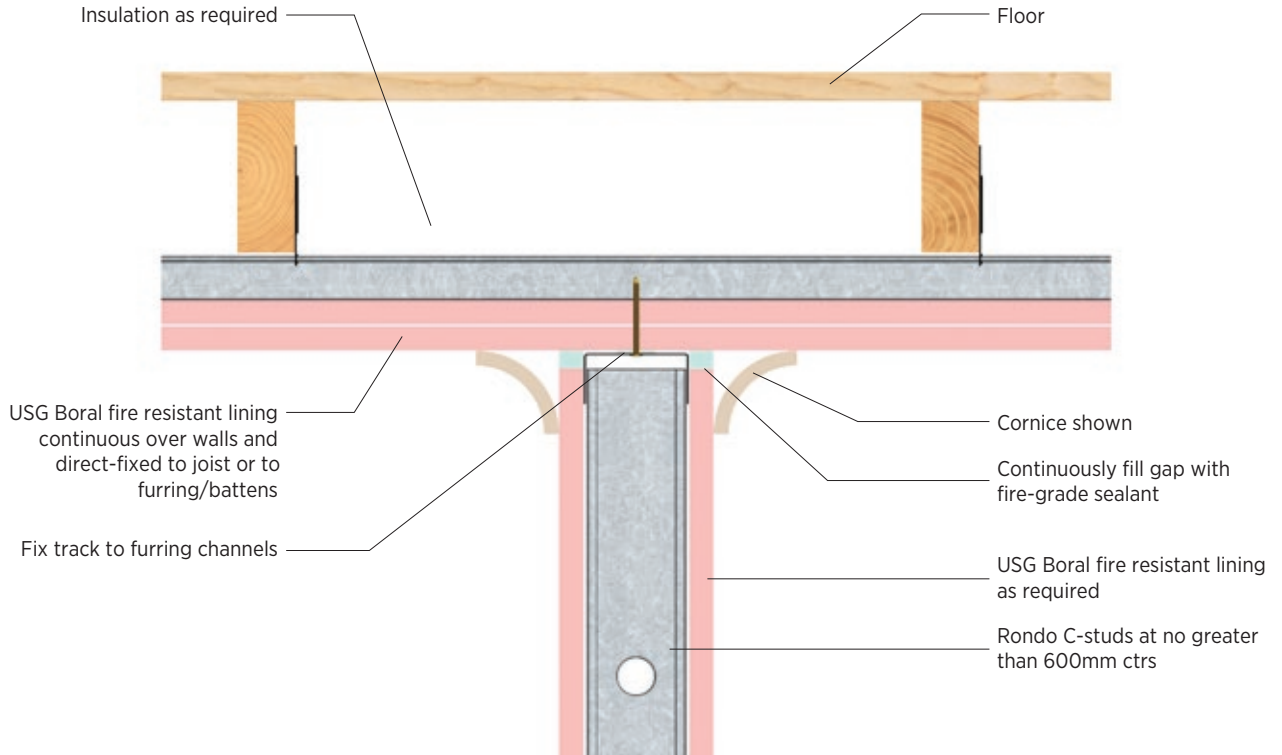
Fire-rated Wall to Fire-rated Ceiling Detail
